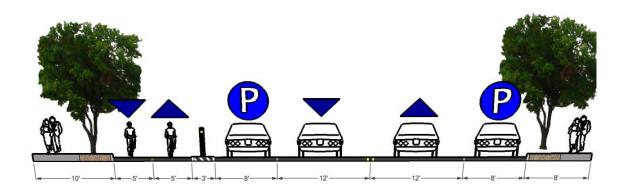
A: Preble Street Selected Design Cross Section Looking East
